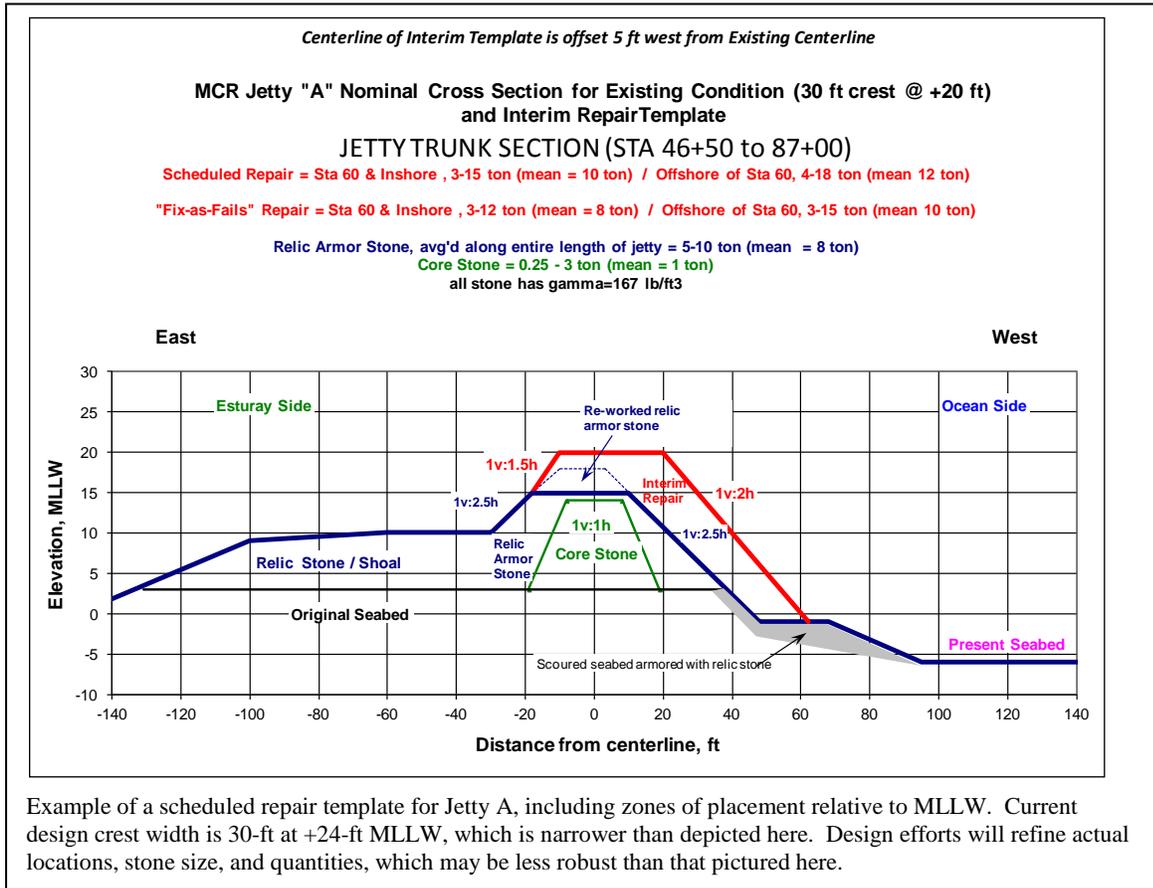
Jetty A Example Cross Section of Scheduled Repairs Template
